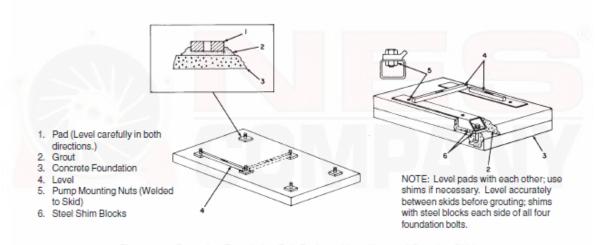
Preparing Foundation Bolt Pads and Installing and Grouting Skids
